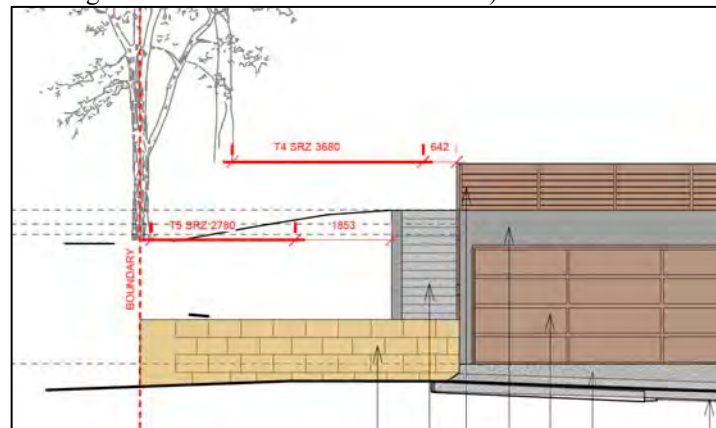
The SRZ for Tree 4 is not impact by the proposed excavation or construction works.. (Source: Site Plans by a skeroberton design and construction dated 18/06/2025).
